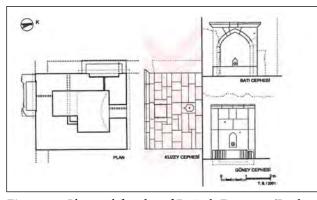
Plan and facades of Dağsalı Fountain (Bozkurt 2002, 357).
